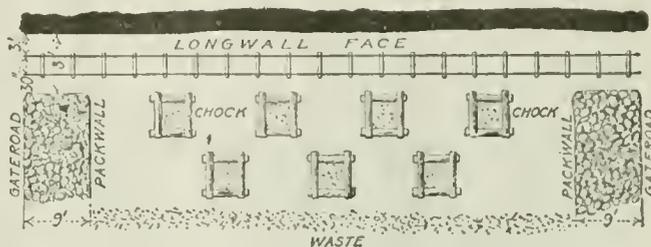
USE OF CRIBS OR CHOCKS ON A LONGWALL FACE
